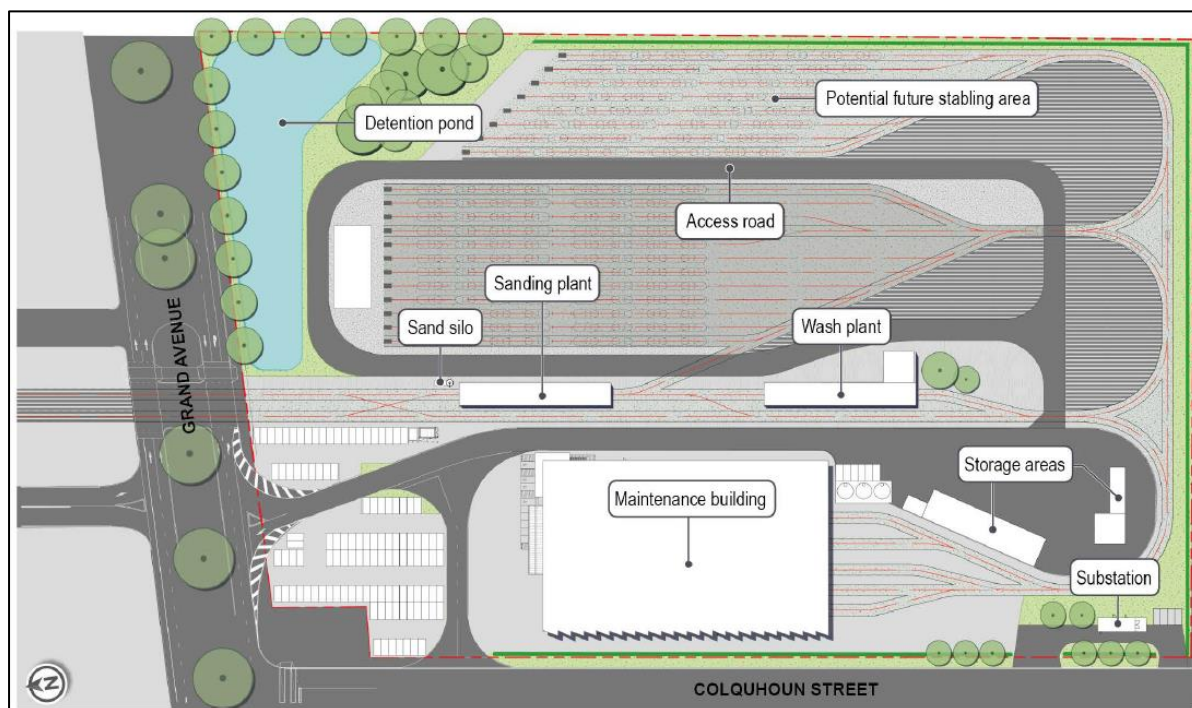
indicative design of stabling and maintenance facility at 4 Grand Avenue as proposed under SSI 8285
